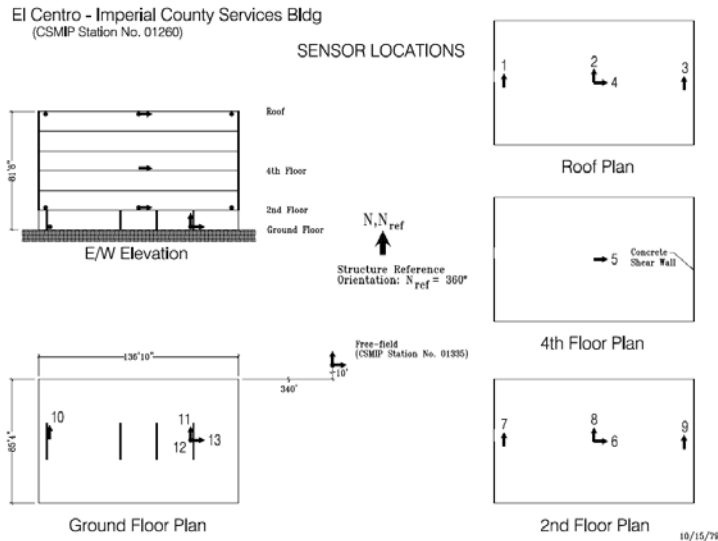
Layout of the sensors installed at ICS building (taken from CSMIP web site).
